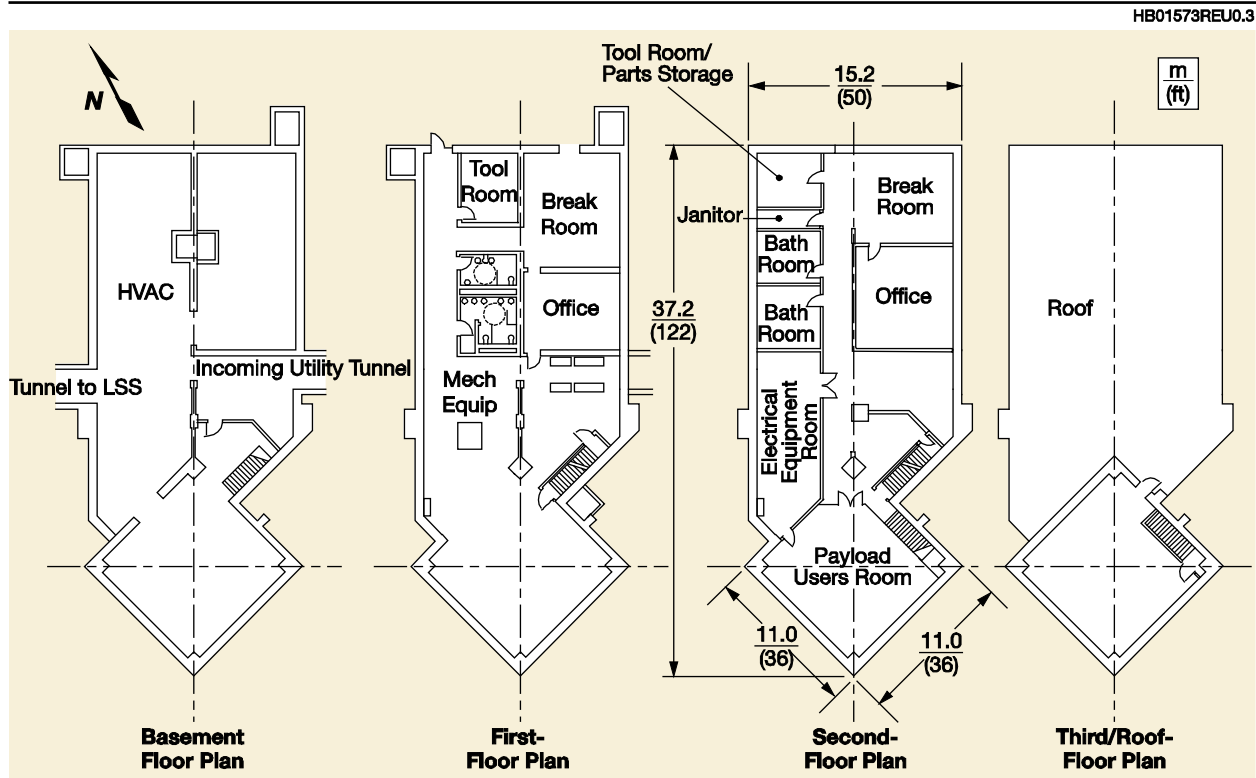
Space Launch Complex 37 Support Equipment Building (SEB)
